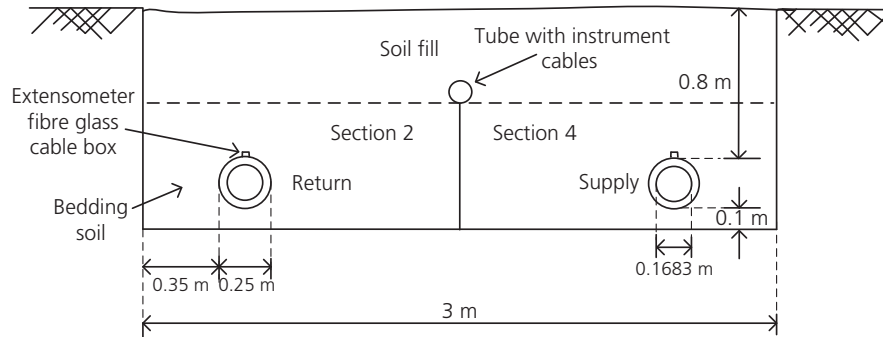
Trench A–A cross-section with pipes of sections 2 and 4 showing the extensometer position on the pipes' crown
